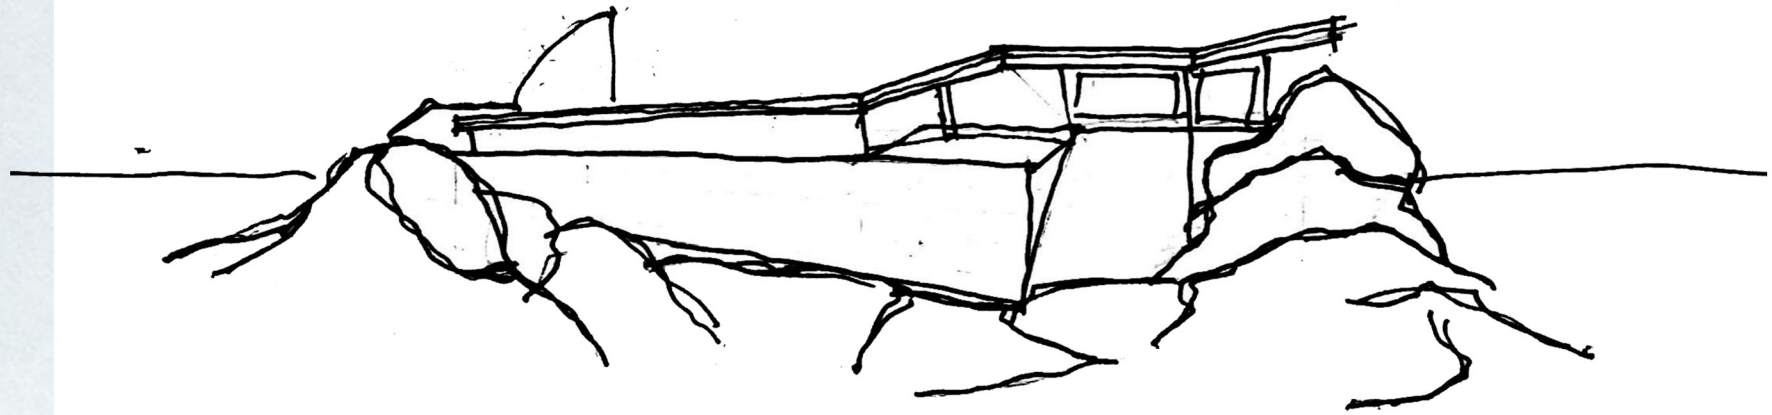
Building in rocks;(Rorich, 2020: own drawing)
